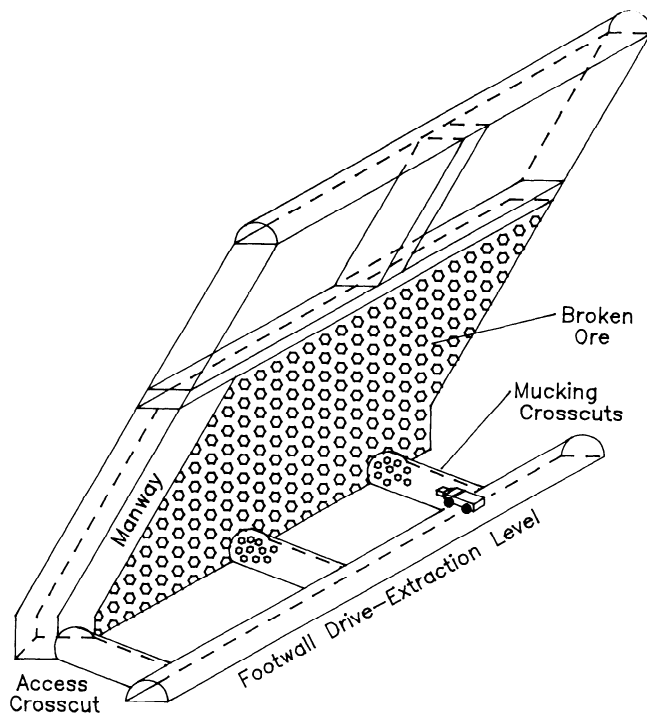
Typical shrinkage stope with LHD extraction.
